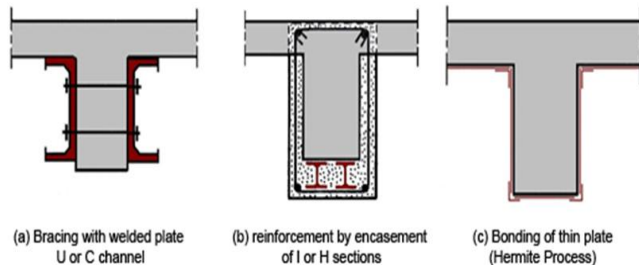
STRENGTHENING USING STEEL SECTION^[9]
